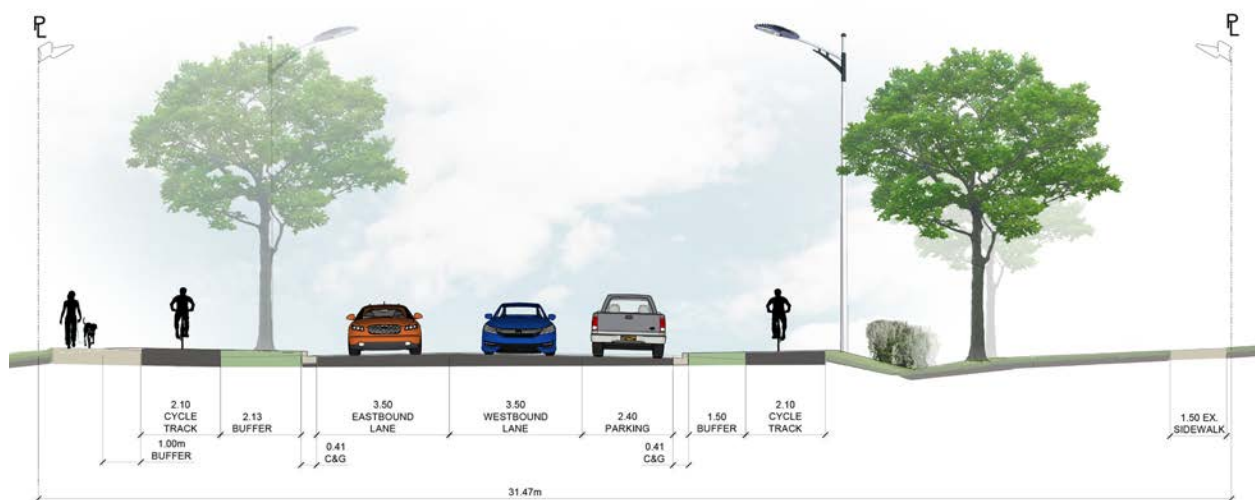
THE WEST END TYPICAL SECTION - INTERIM AND ULTIMATE
